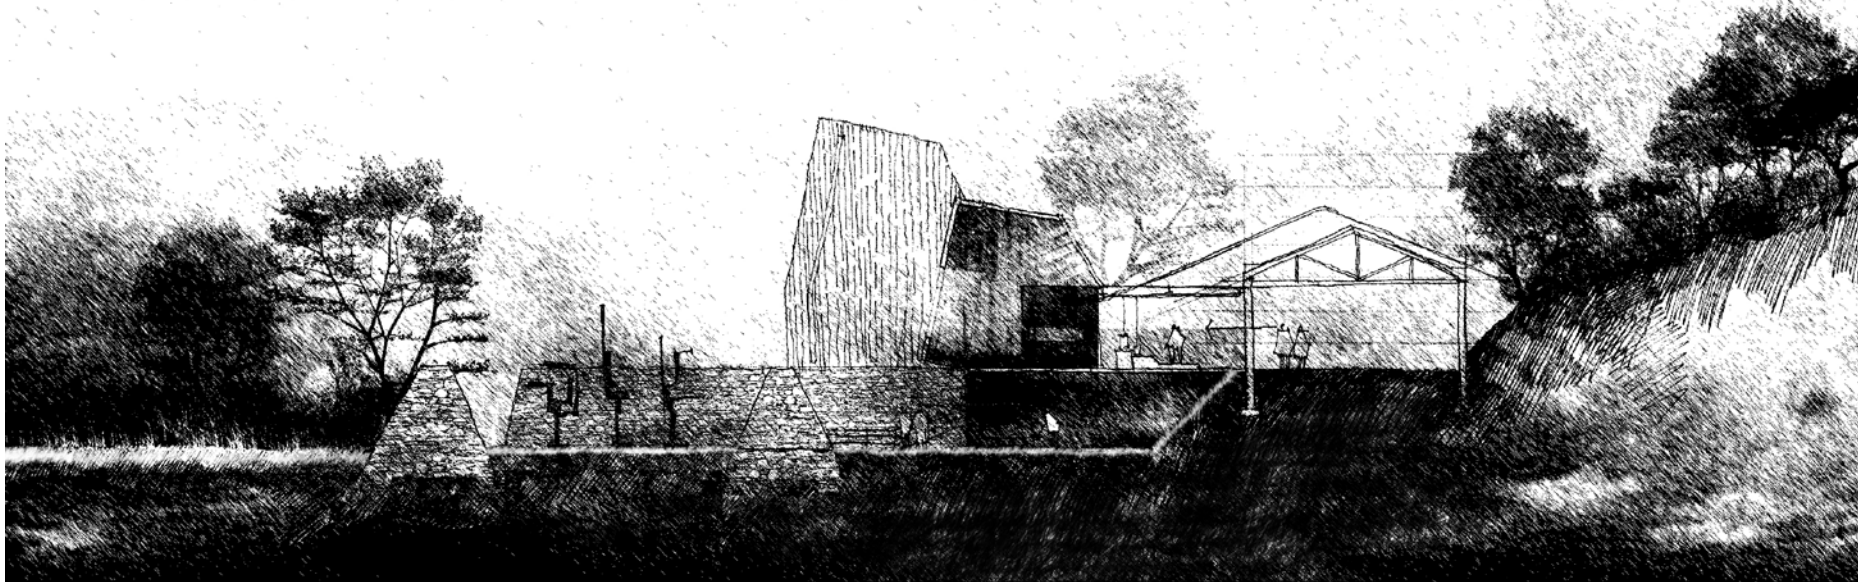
Early conceptual work, building sections (Author, 2011)
